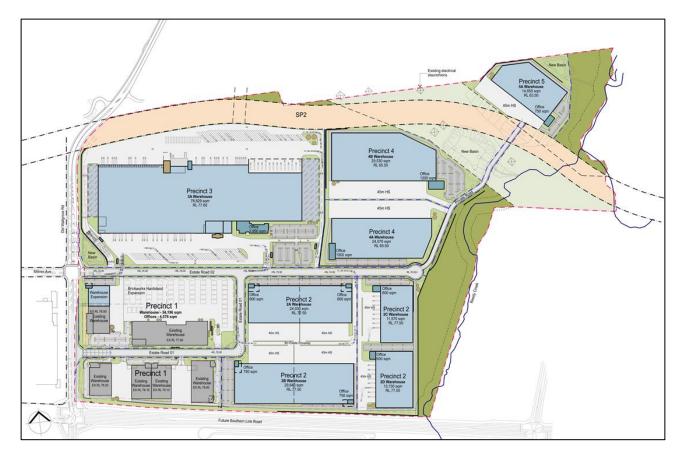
Proposed Southern Link Road Network and Alignment with Respect to the Site Plan (Source: SBA Architects)
